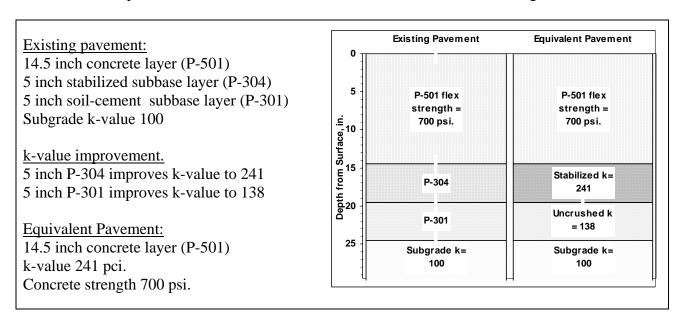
Rigid Pavement Example 2 Cross-Section
